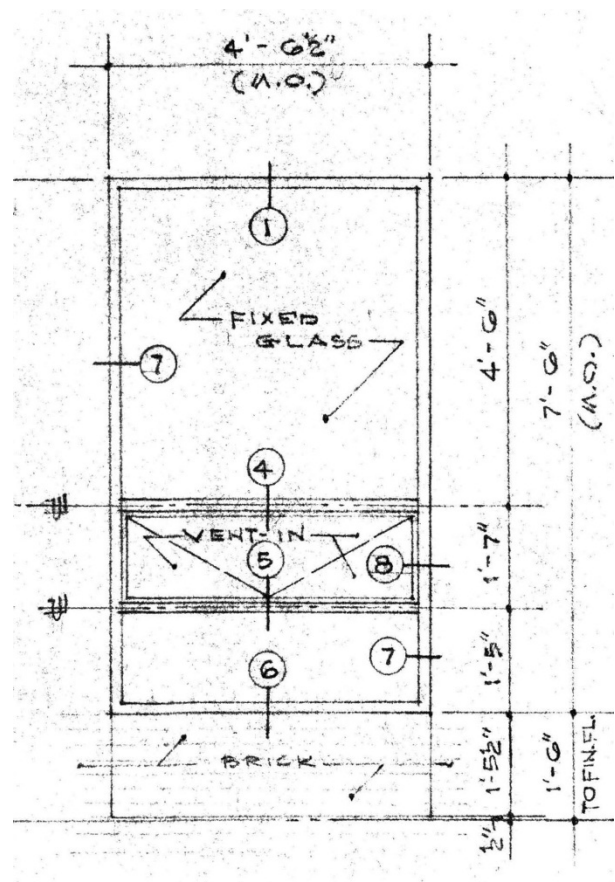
Elevation of typical Type 'B' window. [From 1968 Drawing A-20.]
